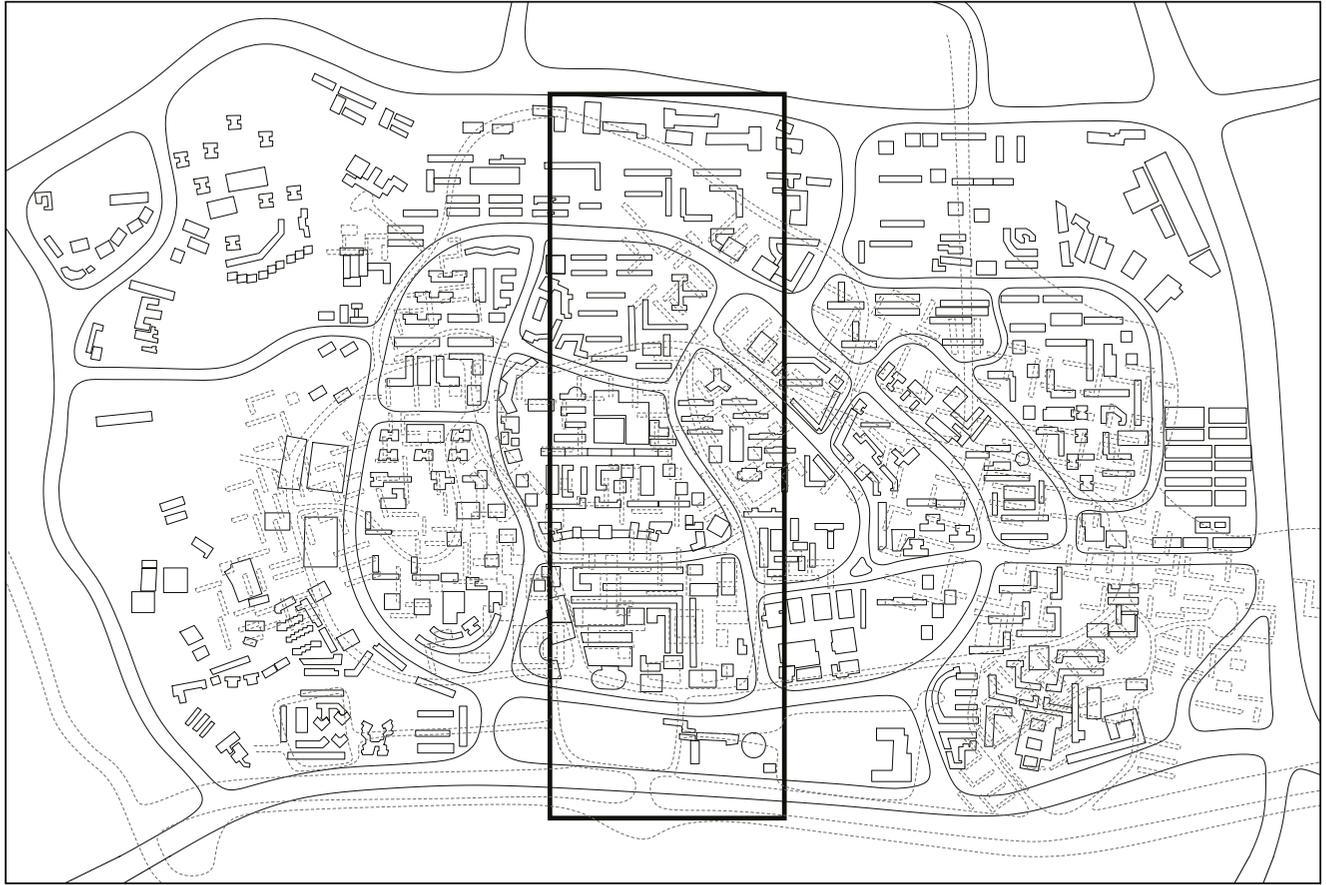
Inset detail of site plan: Void Deck Planned Utopias Toa Payoh
